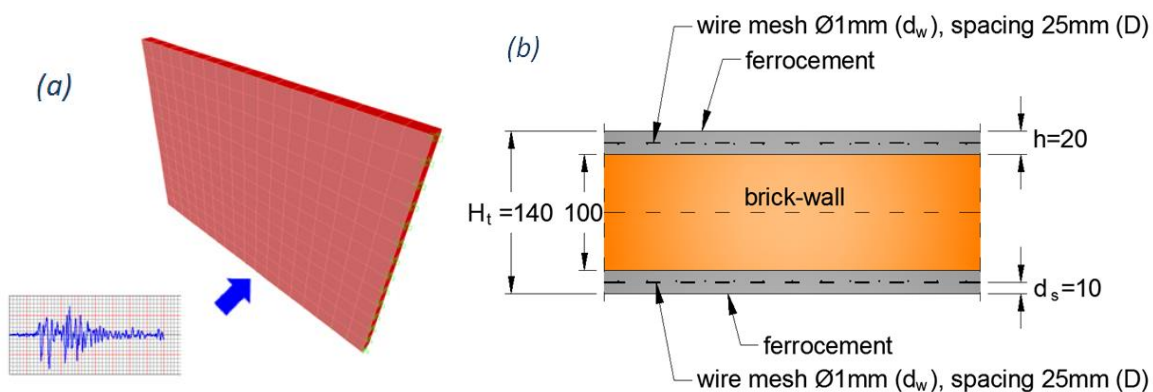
(a) Half-Brick-Thick Wall Panel; (b) Section of Half-Brick-Thick Wall Panel
